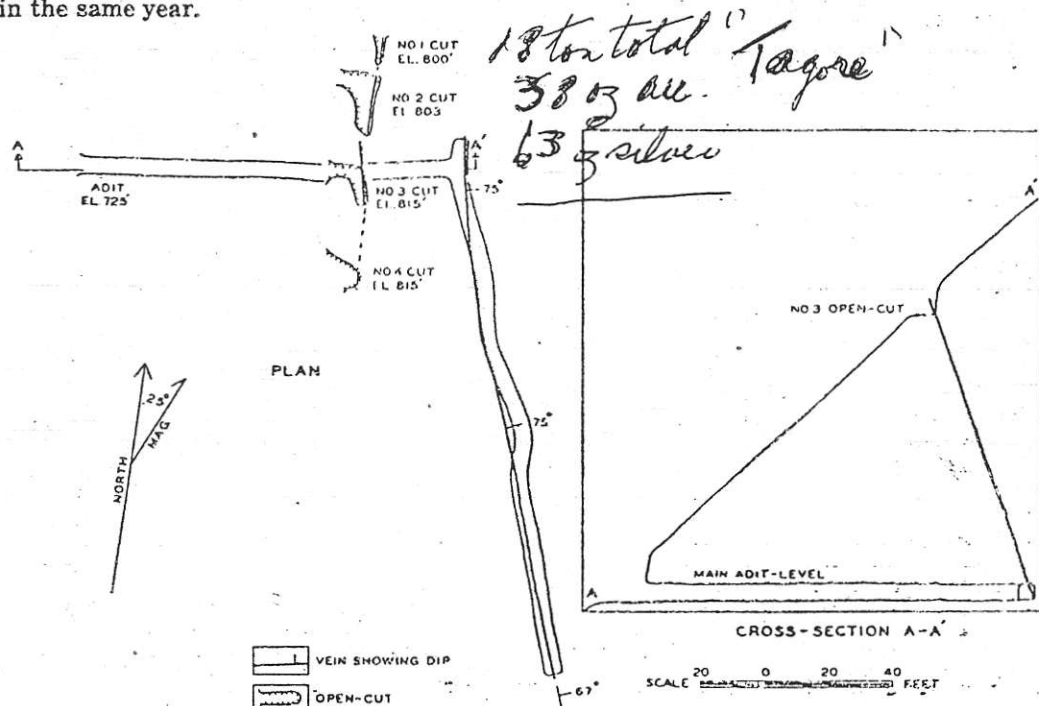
Golden Portal (formerly Golden Gate): Plan and elevation of workings.
